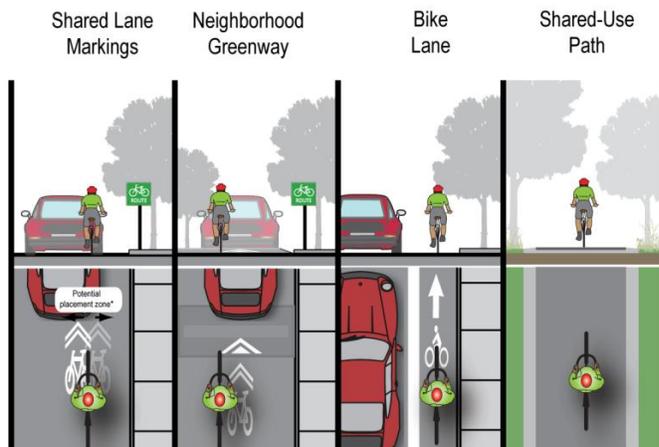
Bikeway facility types recommended in the Whitewater Bicycle and Pedestrian Plan
